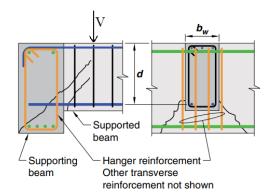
Diagram of the support beam reinforcement in the junction zone with the supported beam [5]
